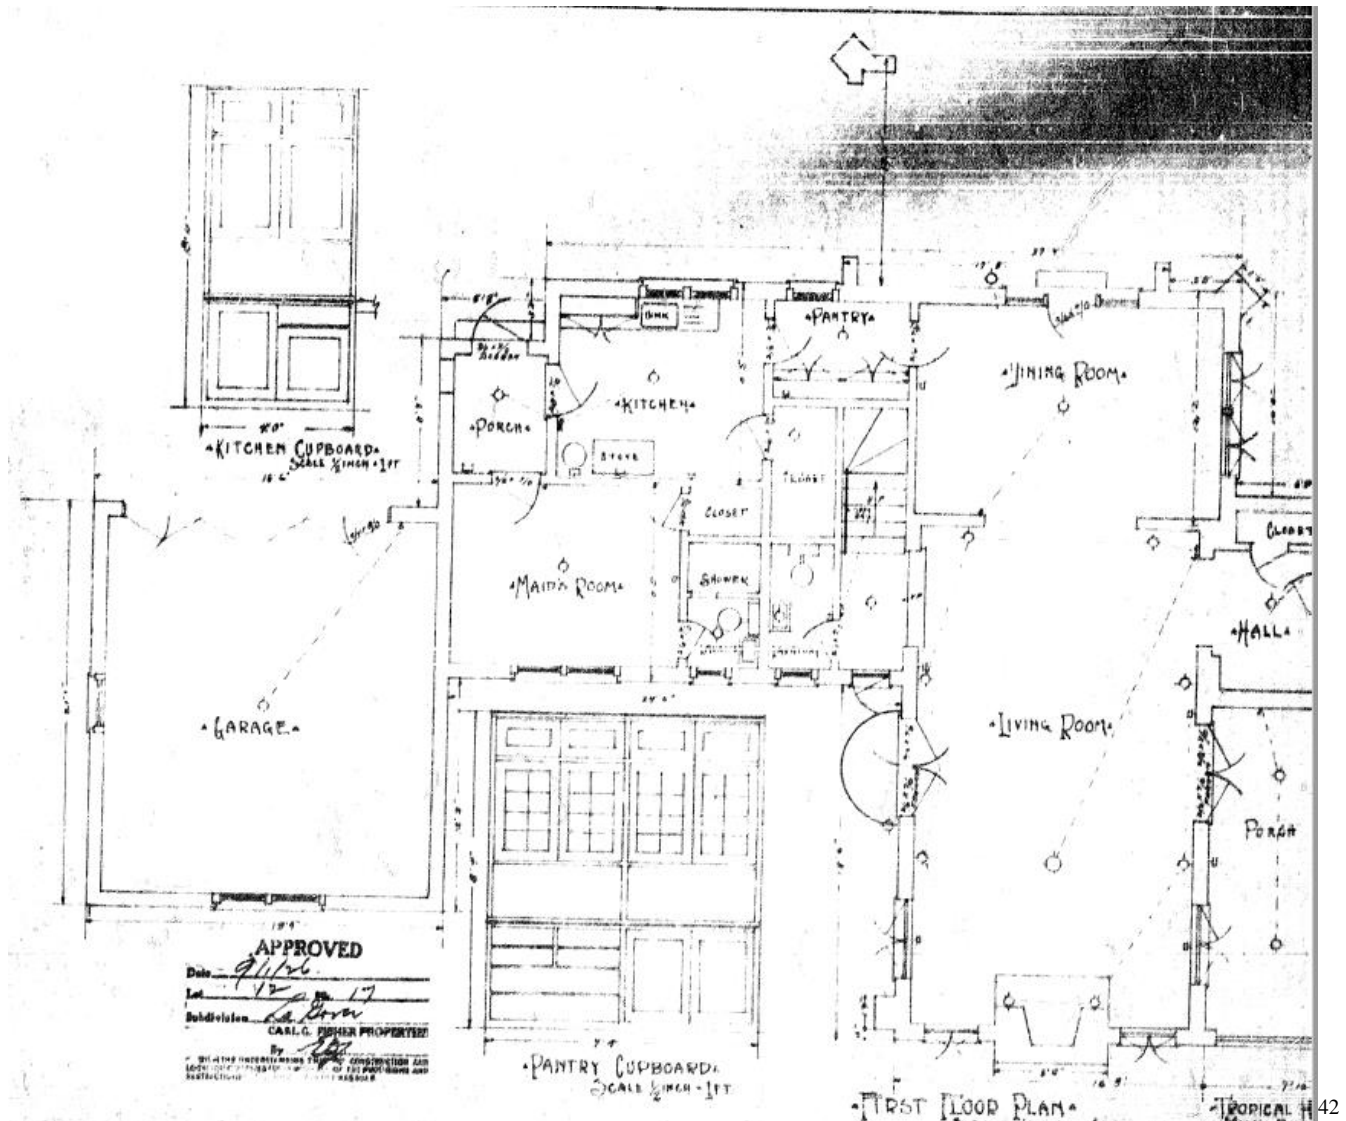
Original first floor building plans for 5208 Alton Road, September 1, 1926.
